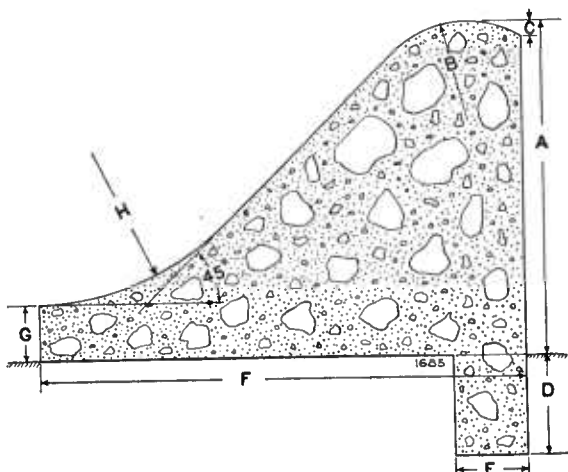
Concrete gravity dam. Being generally more easily handled than masonry, the use of concrete is common in dam construction. For dimensions see Table 4
